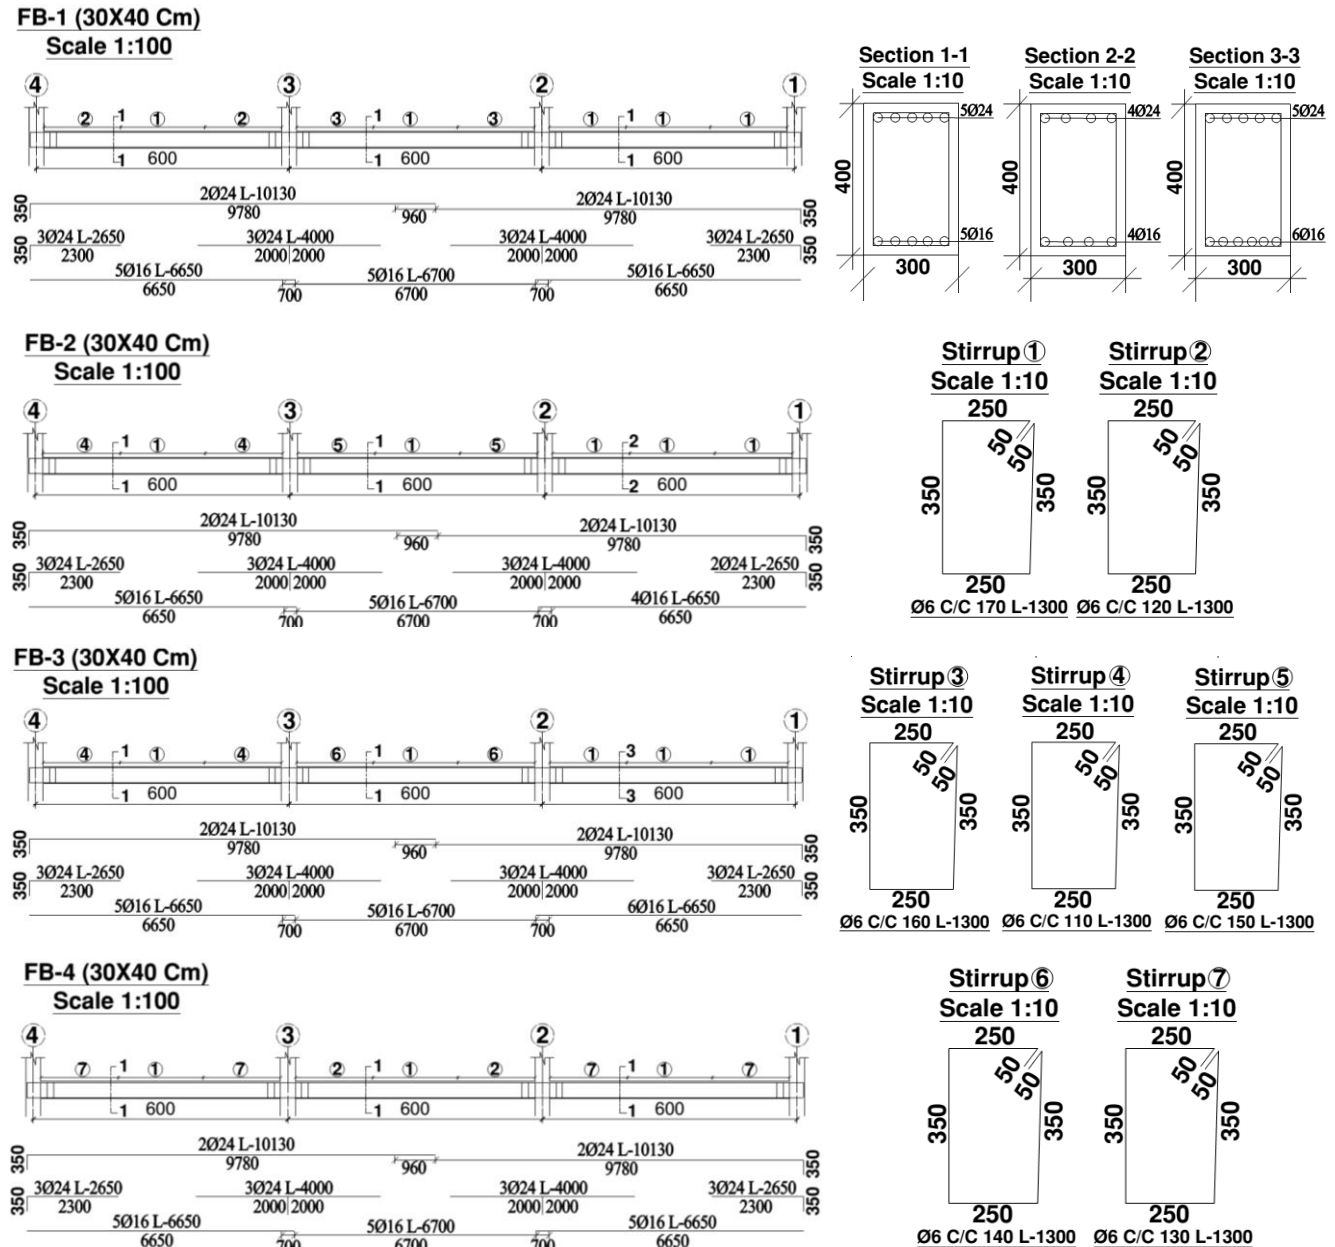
Sample beam detailing for G+12 building with C-40 concrete
